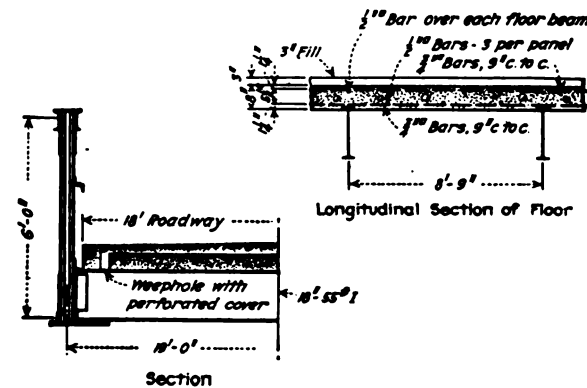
Concrete slab floor for highway steel truss span, Iowa Highway Commission.
